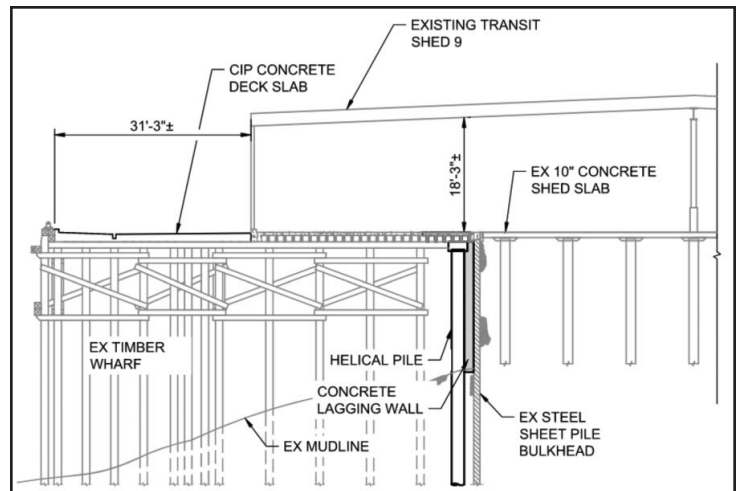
Cross section showing helical pile and concrete lagging wall system, which encases the existing bulkhead
